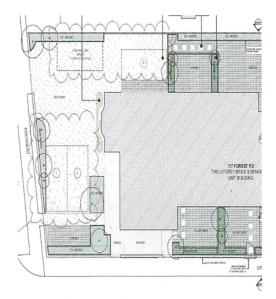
Proposed front landscaped area Source: Landscape Plan BKA Architecture
